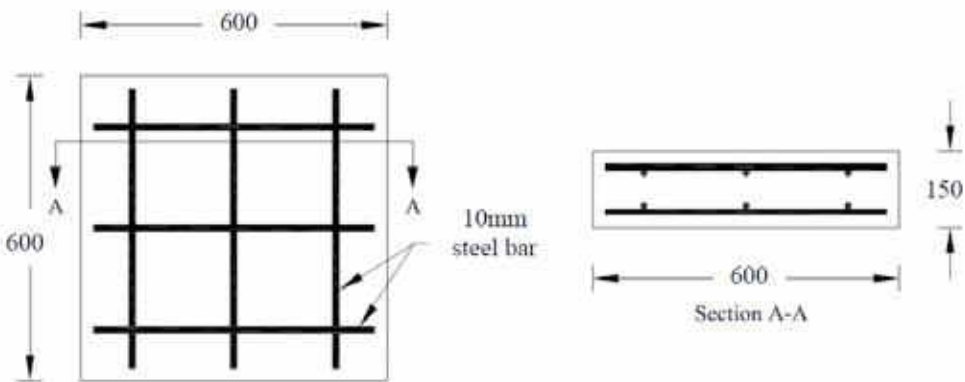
The size and steel reinforcement arrangement of in the NRC and HSFRC panels.
